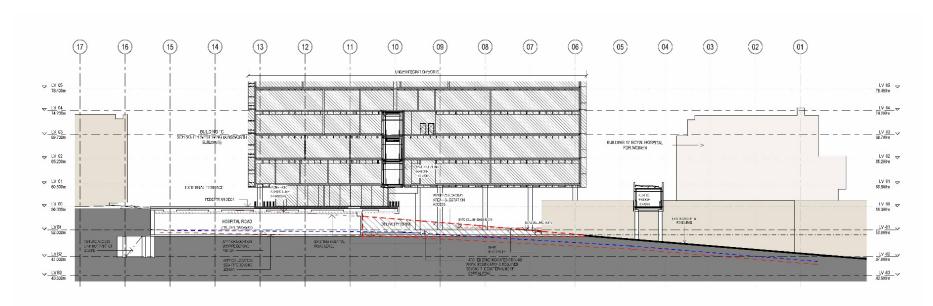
Proposed section along Hospital Road looking east. Plan by BVN Architecture 20.12.2018, provided by Advisian.
